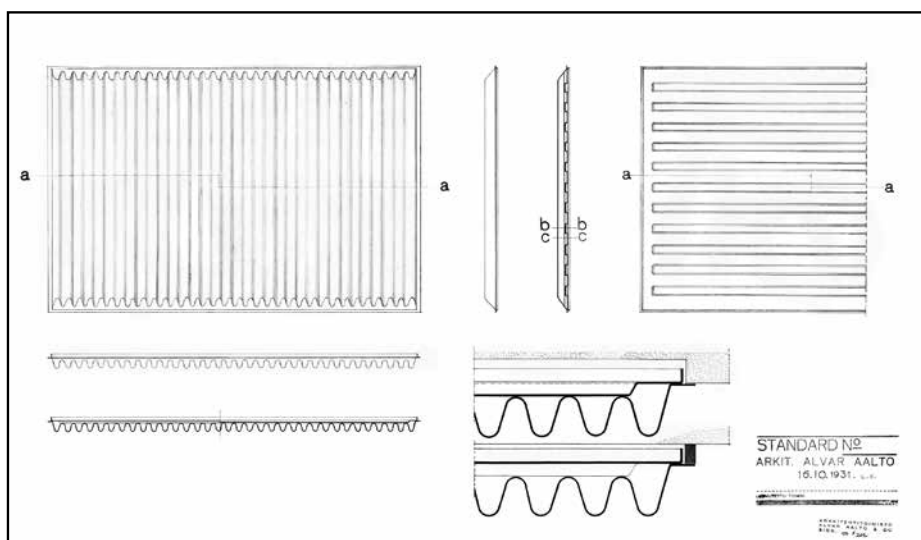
Aalto's standard drawing of a wall-mounted radiator. It would appear that the radiator design was never finished by the architect because he failed to attach to his team the contractor he had wanted to work with. Drawing No. 50-202. The drawing has been edited. AAM.
